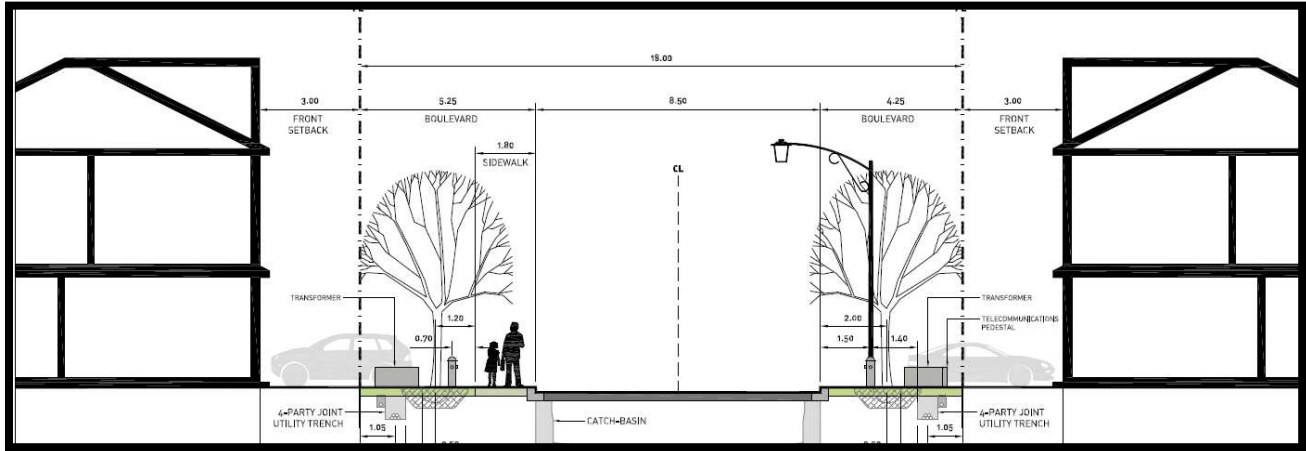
18.0 m Local Road ROW for 2275 Mer Bleue Road
